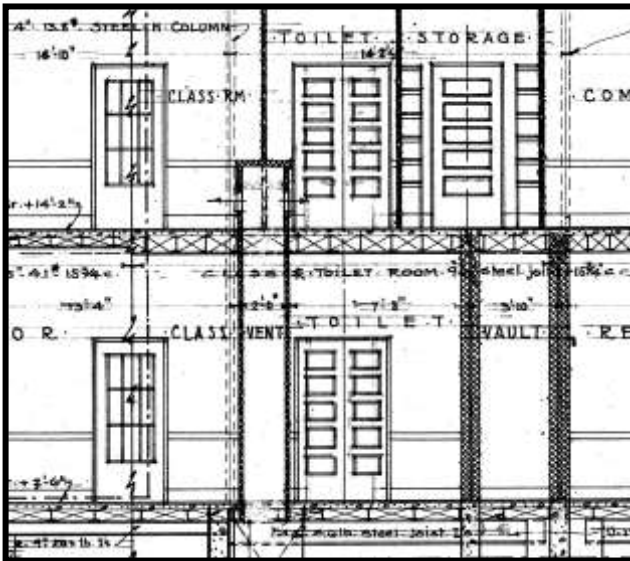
Part of a cross-section of the building from the 1922 drawings, showing
